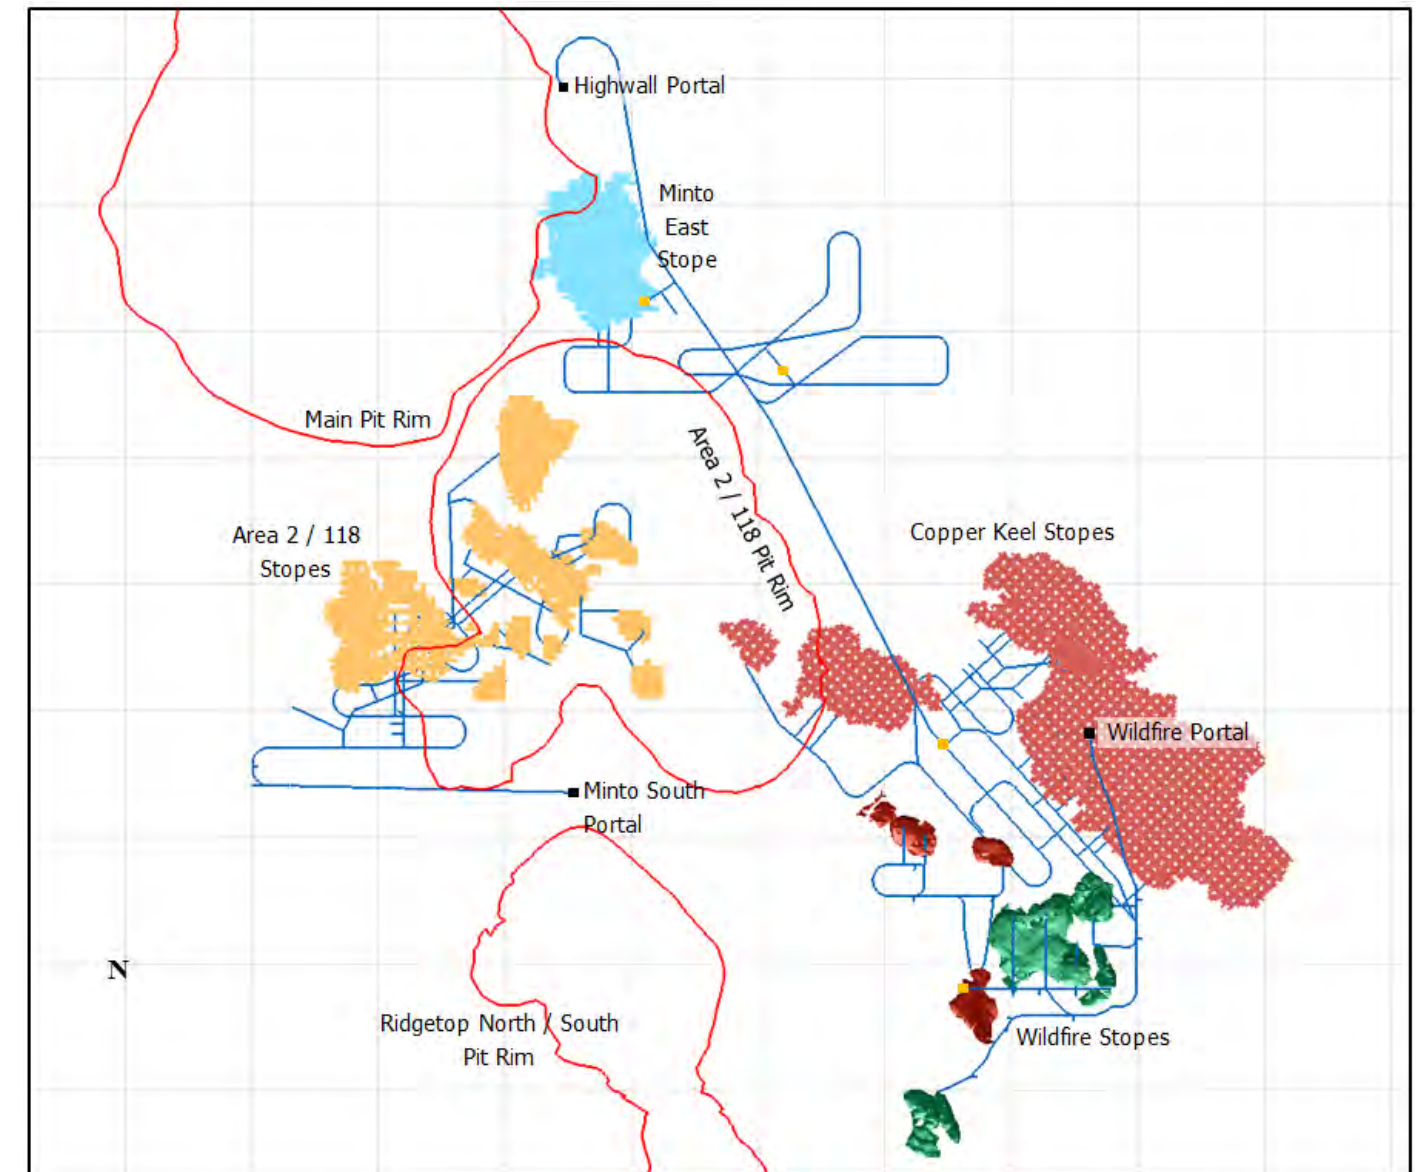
Plan View of the Minto South Underground Deposit and Wildfire Underground.
